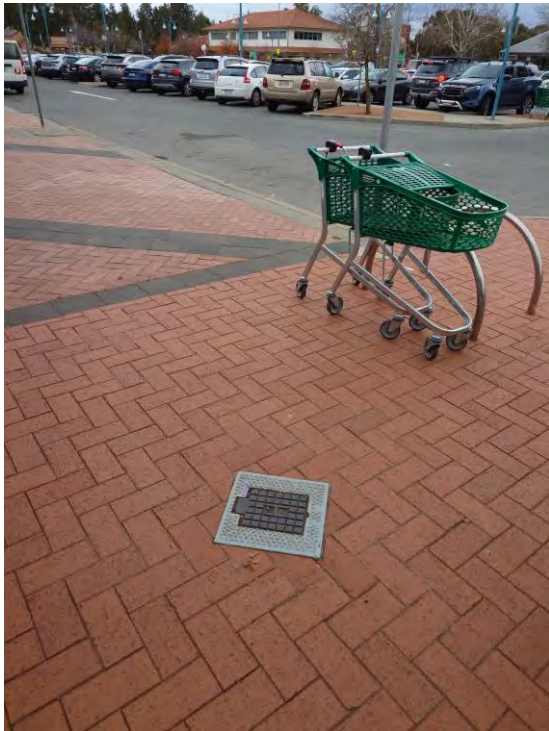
Existing Fire Hydrant in Central Carpark (north west)
